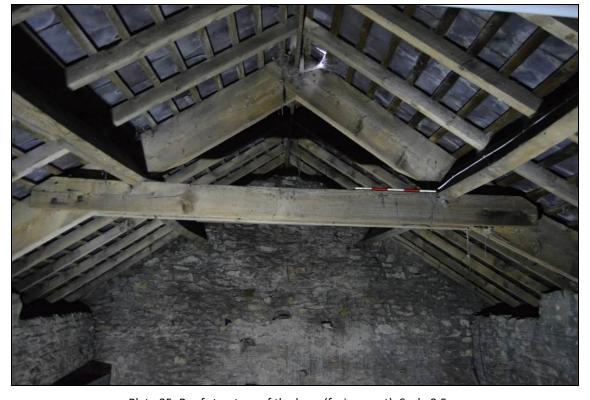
Roof structure of the barn (facing west). Scale 0.5m.
